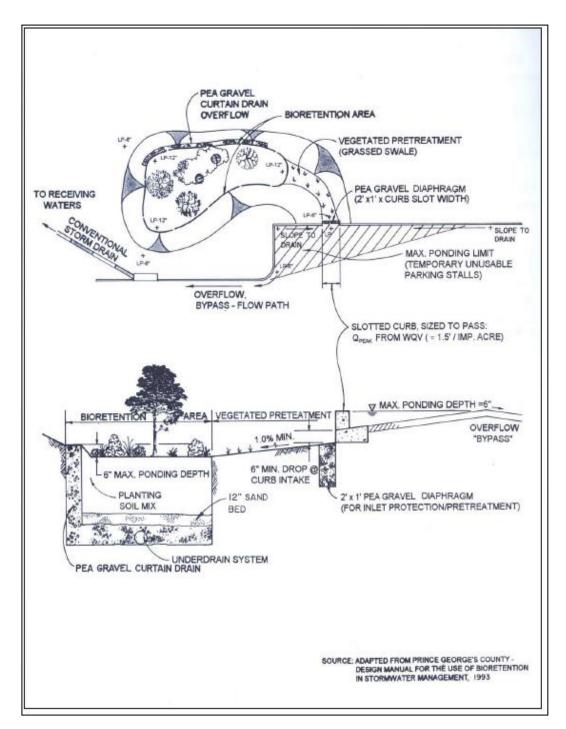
Typical Off-line Bioretention Facility (Source: Claytor and Schueler. 1996. Center for Watershed Protection.)
